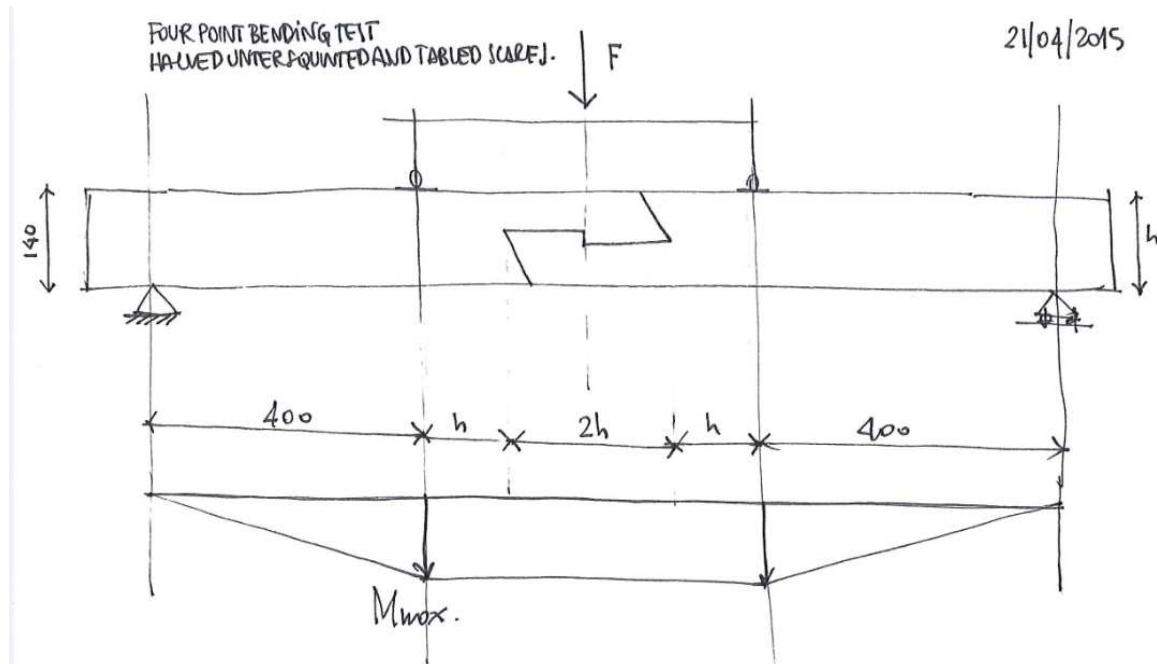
Halved undersquinted & tabled scarf joint. Beam and static asset schema
